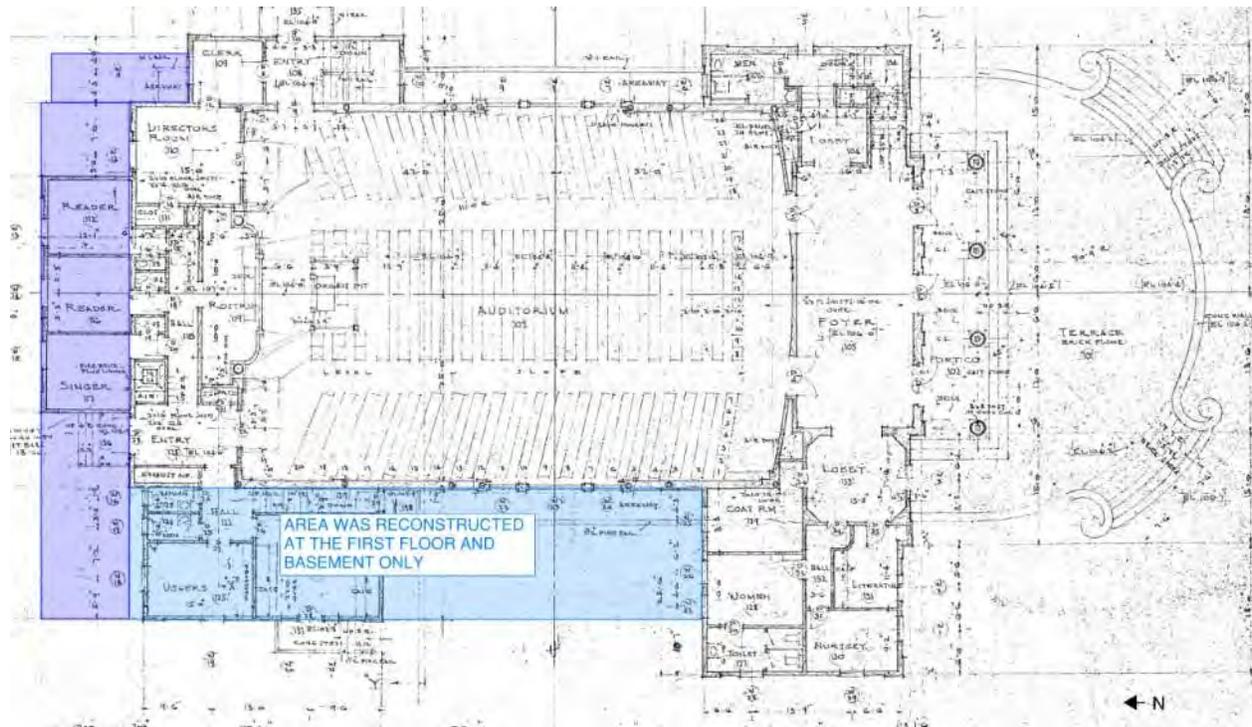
First floor plan view from the 1938 Construction Drawings highlighting the portions of the building reconstructed in 2002.
